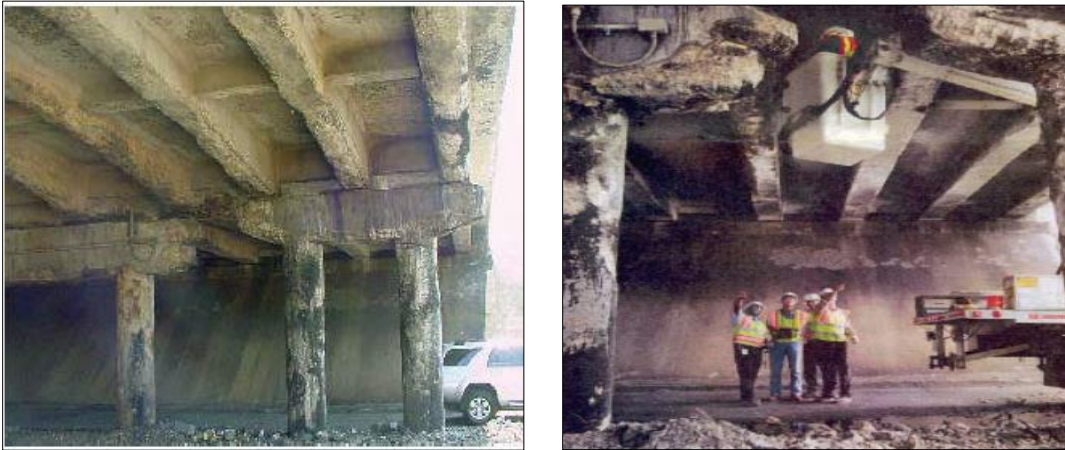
Hydrocarbon fire damaged SH183 bridge over MacArthur Boulevard (Sika Corporation 2006)
